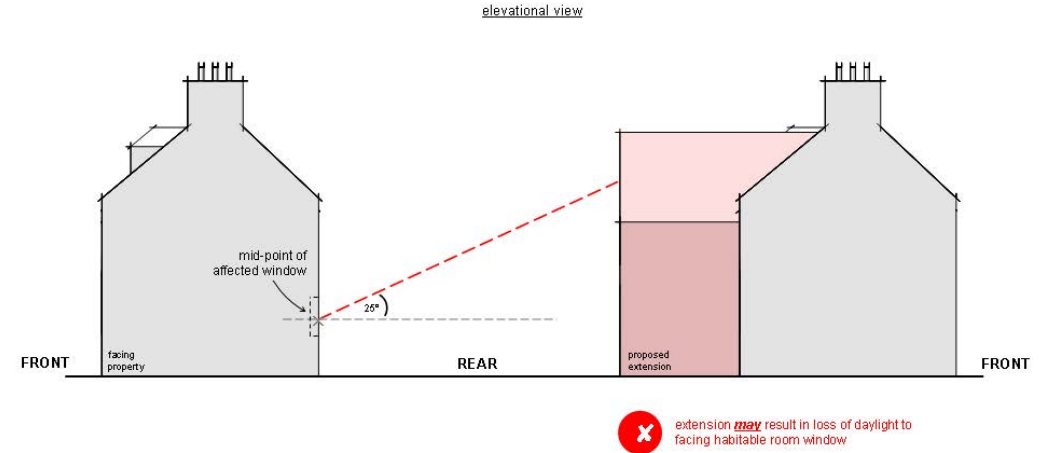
° Method, Proposed extension may result in loss of daylight to adjacent window of a habitable room
